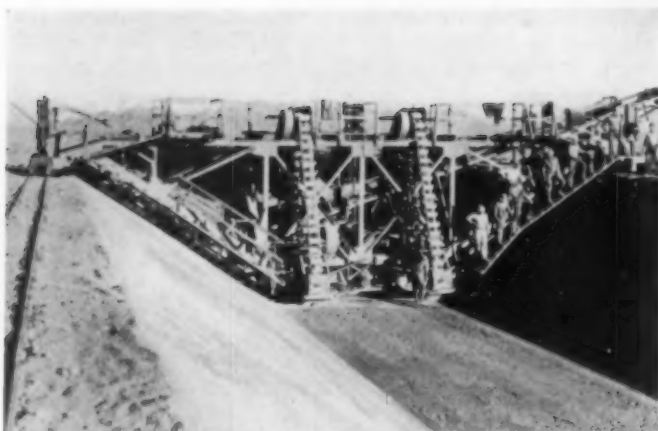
GRADER OR BLADE TYPE OF SUBGRADE TRIMMER DEVELOPED BY JAHN AND BRESSI CONSTRUCTION COMPANY
